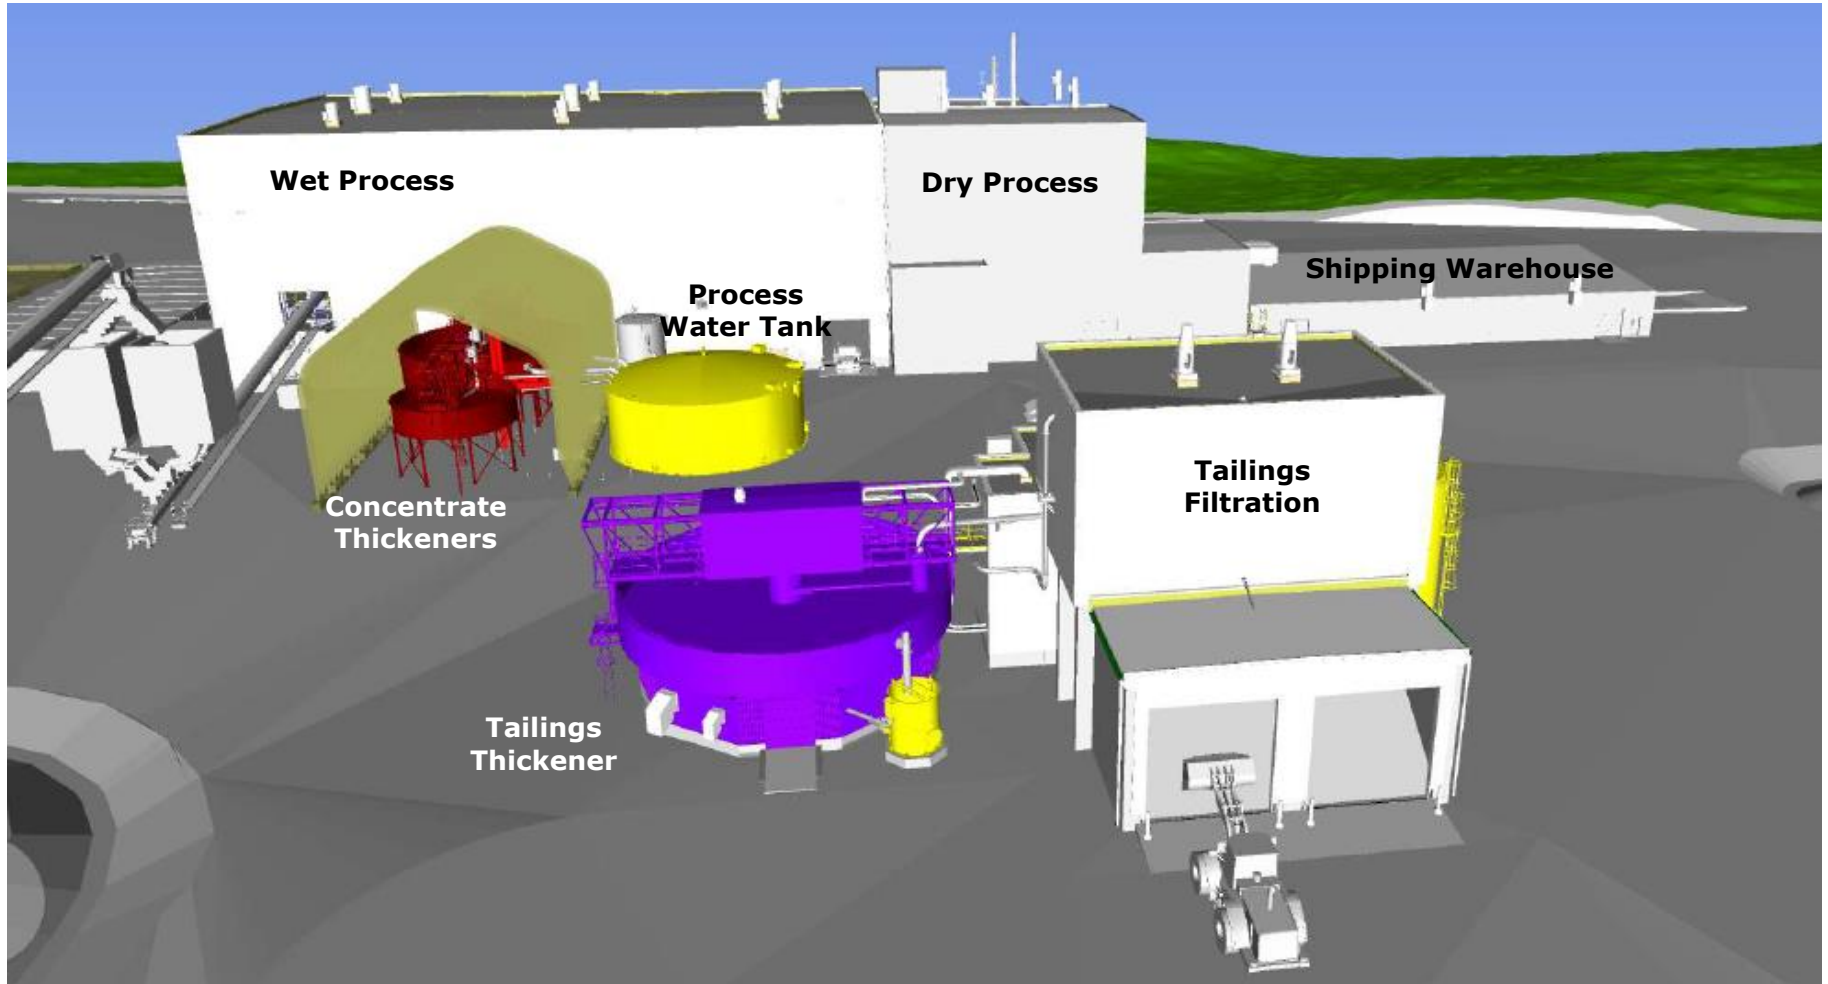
Buildings and Ore Stockpile View, Looking Generally South
